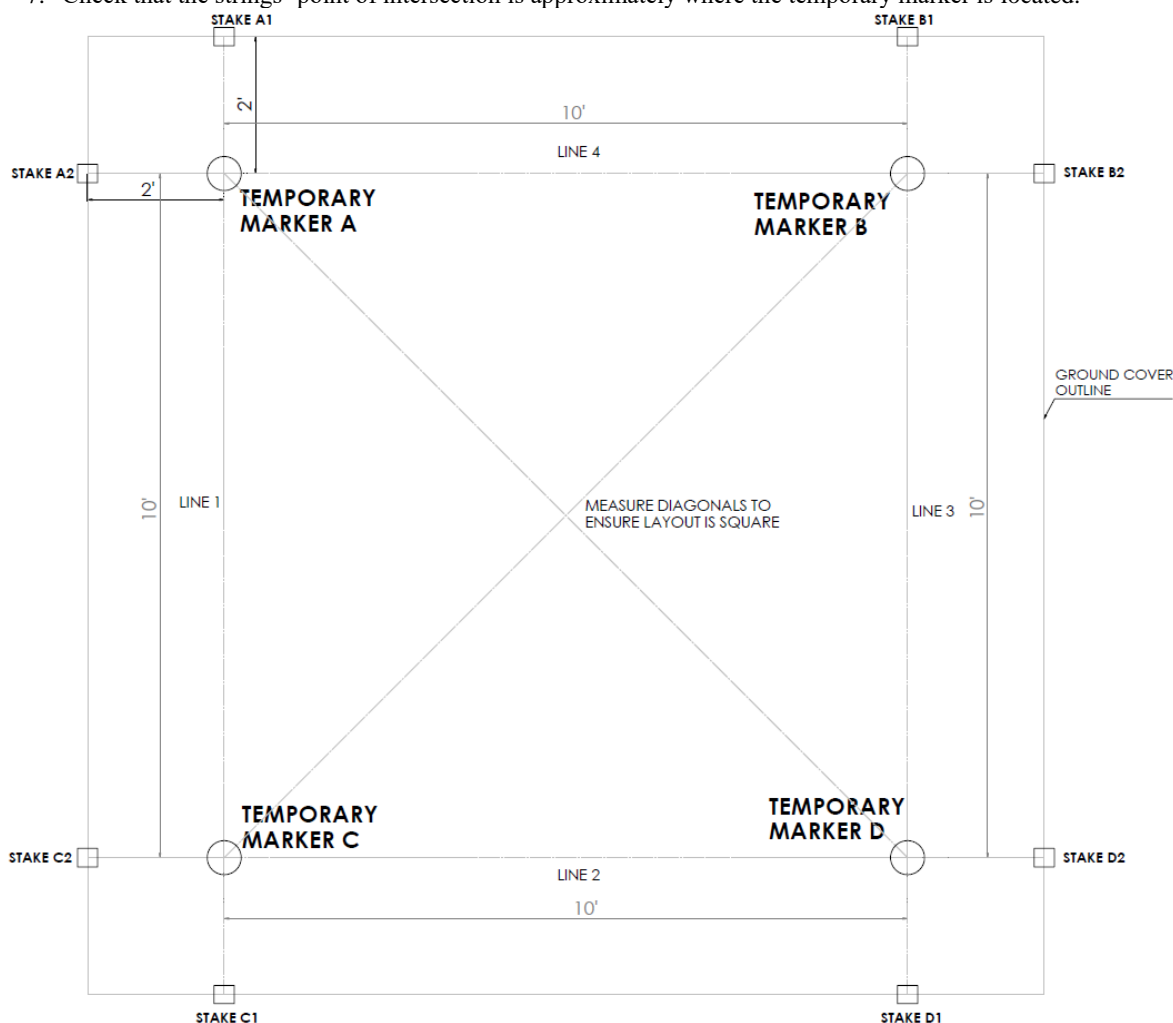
Site layout showing temporary markers, stake location, and greenhouse perimeter.
